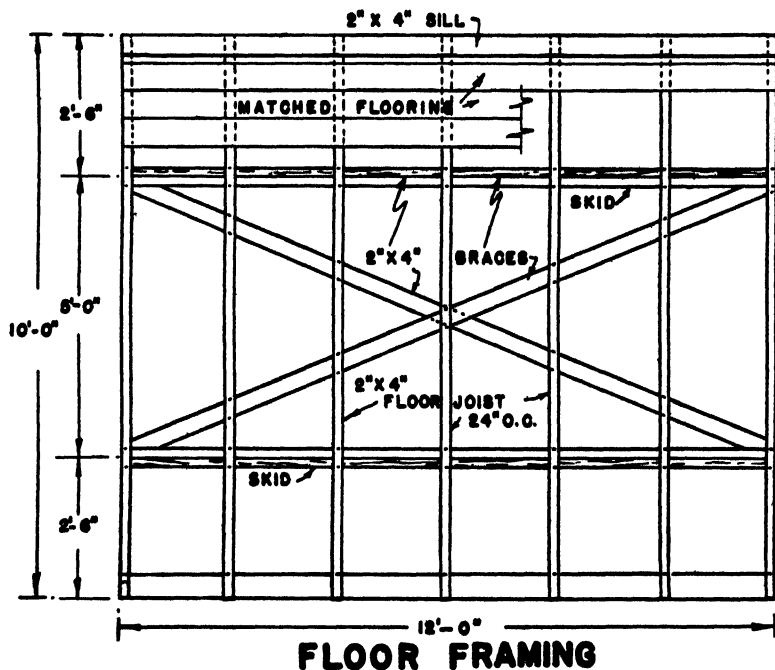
The floor plan of the colony brooder house. Note the bracing of the runners to prevent racking.
